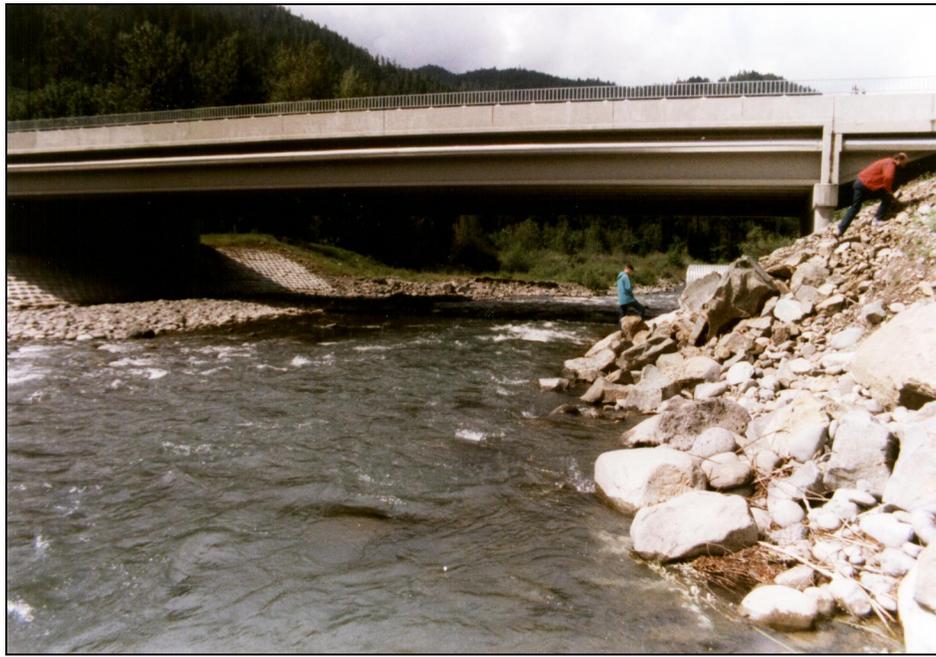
Route 58 bridge. D/S view. Easterly abutment fill is also protected by concrete-filled fabric, which was selected for both abutment fills due to thinner than riprap cross section in relatively narrow channel under bridge, and poor past performance of rounded riprap on steep slopes.
